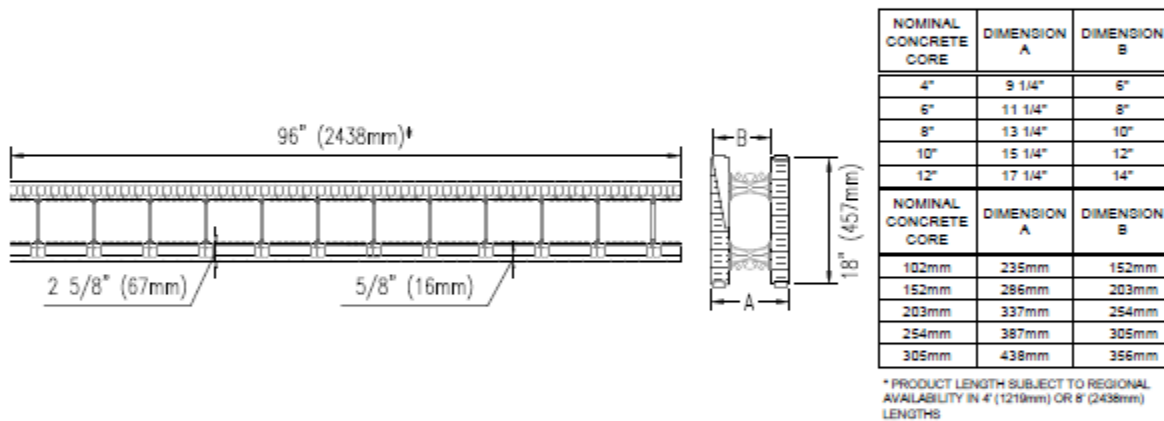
DOUBLE SIDED TAPER TOP FORM UNIT
